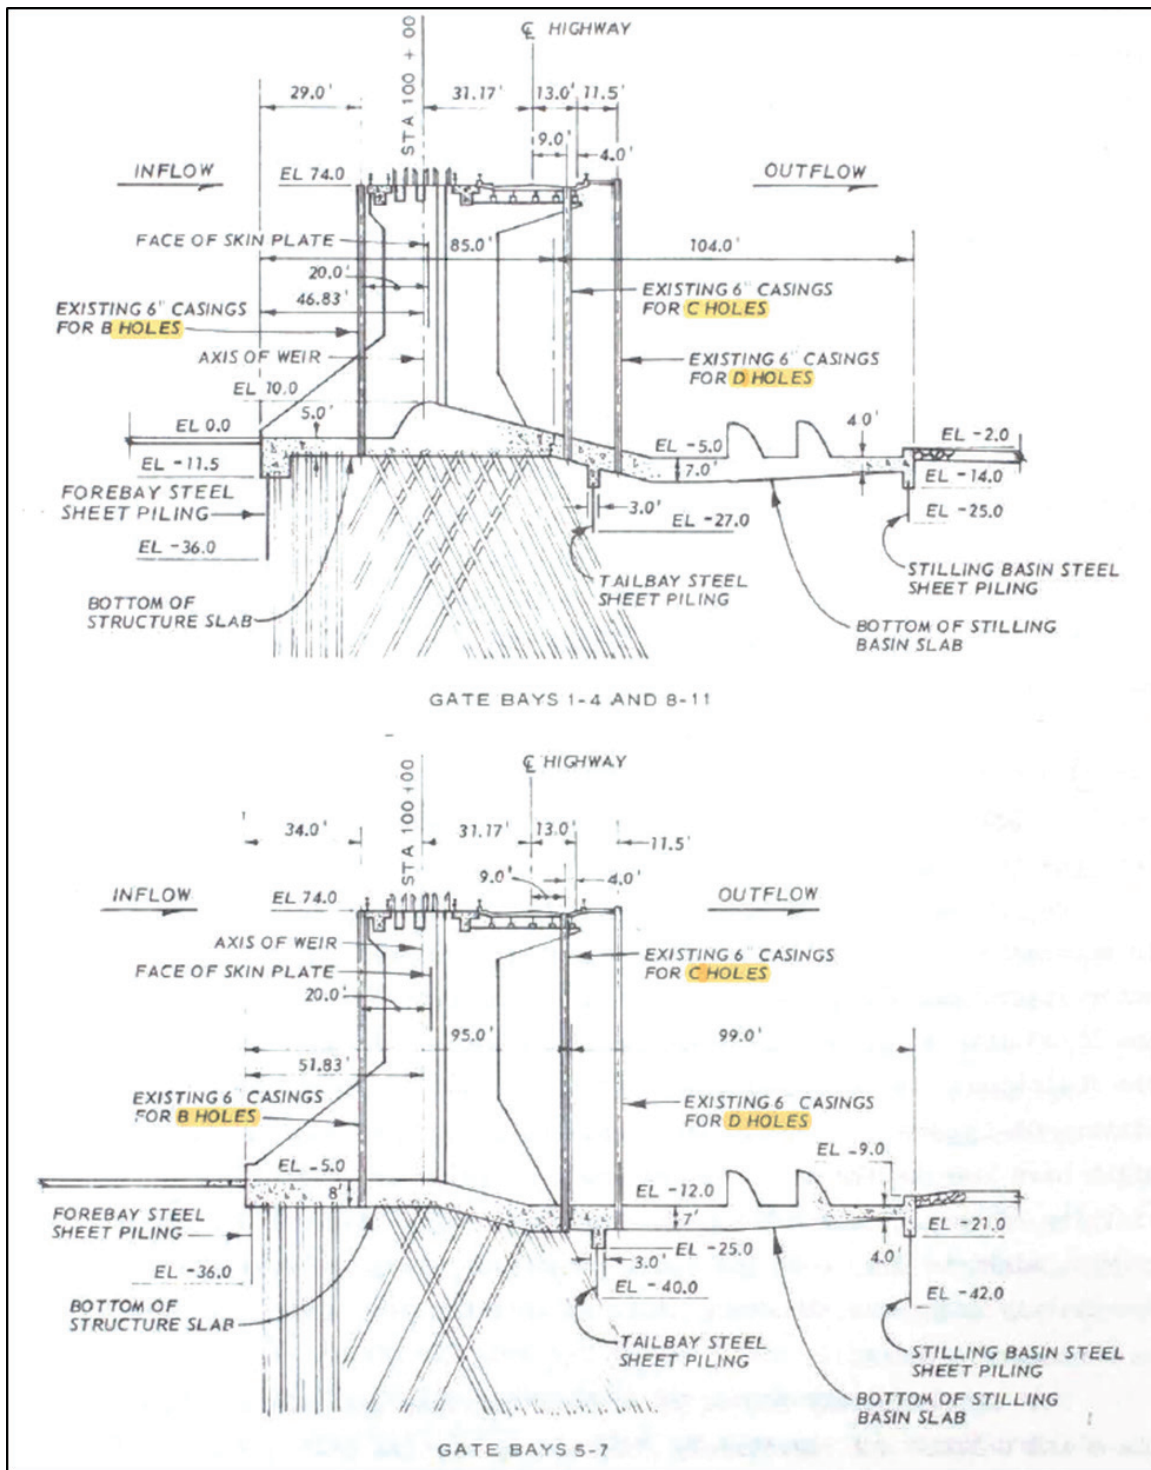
Boring locations and sheet pile elevations in profile used to determine void limits (Wilson 1978).
